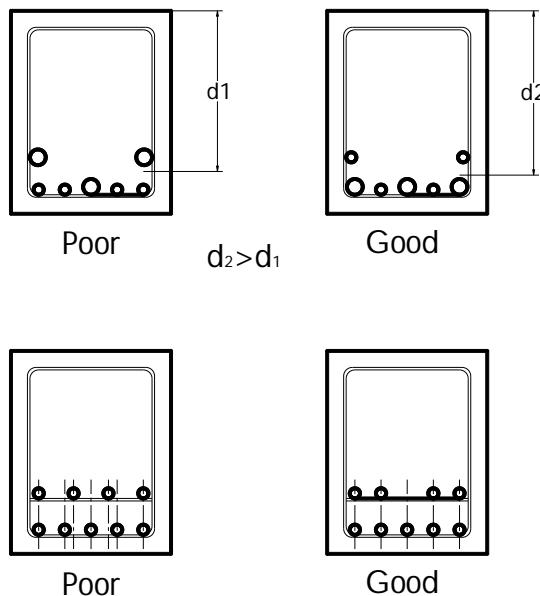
Good and poor practices of arrangement of bars in cross-section
